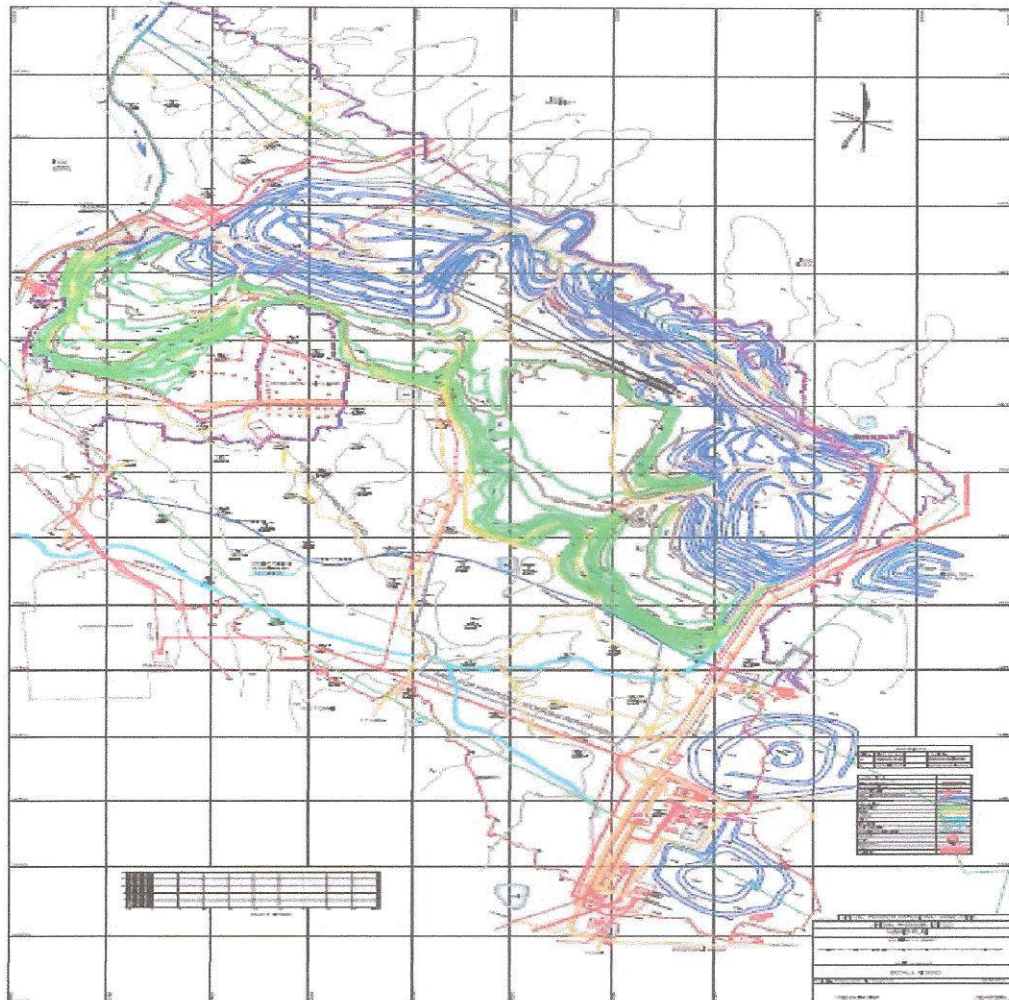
Plan of the Jindal Opencast Coal Mine, Dongamauha, Raigarh
